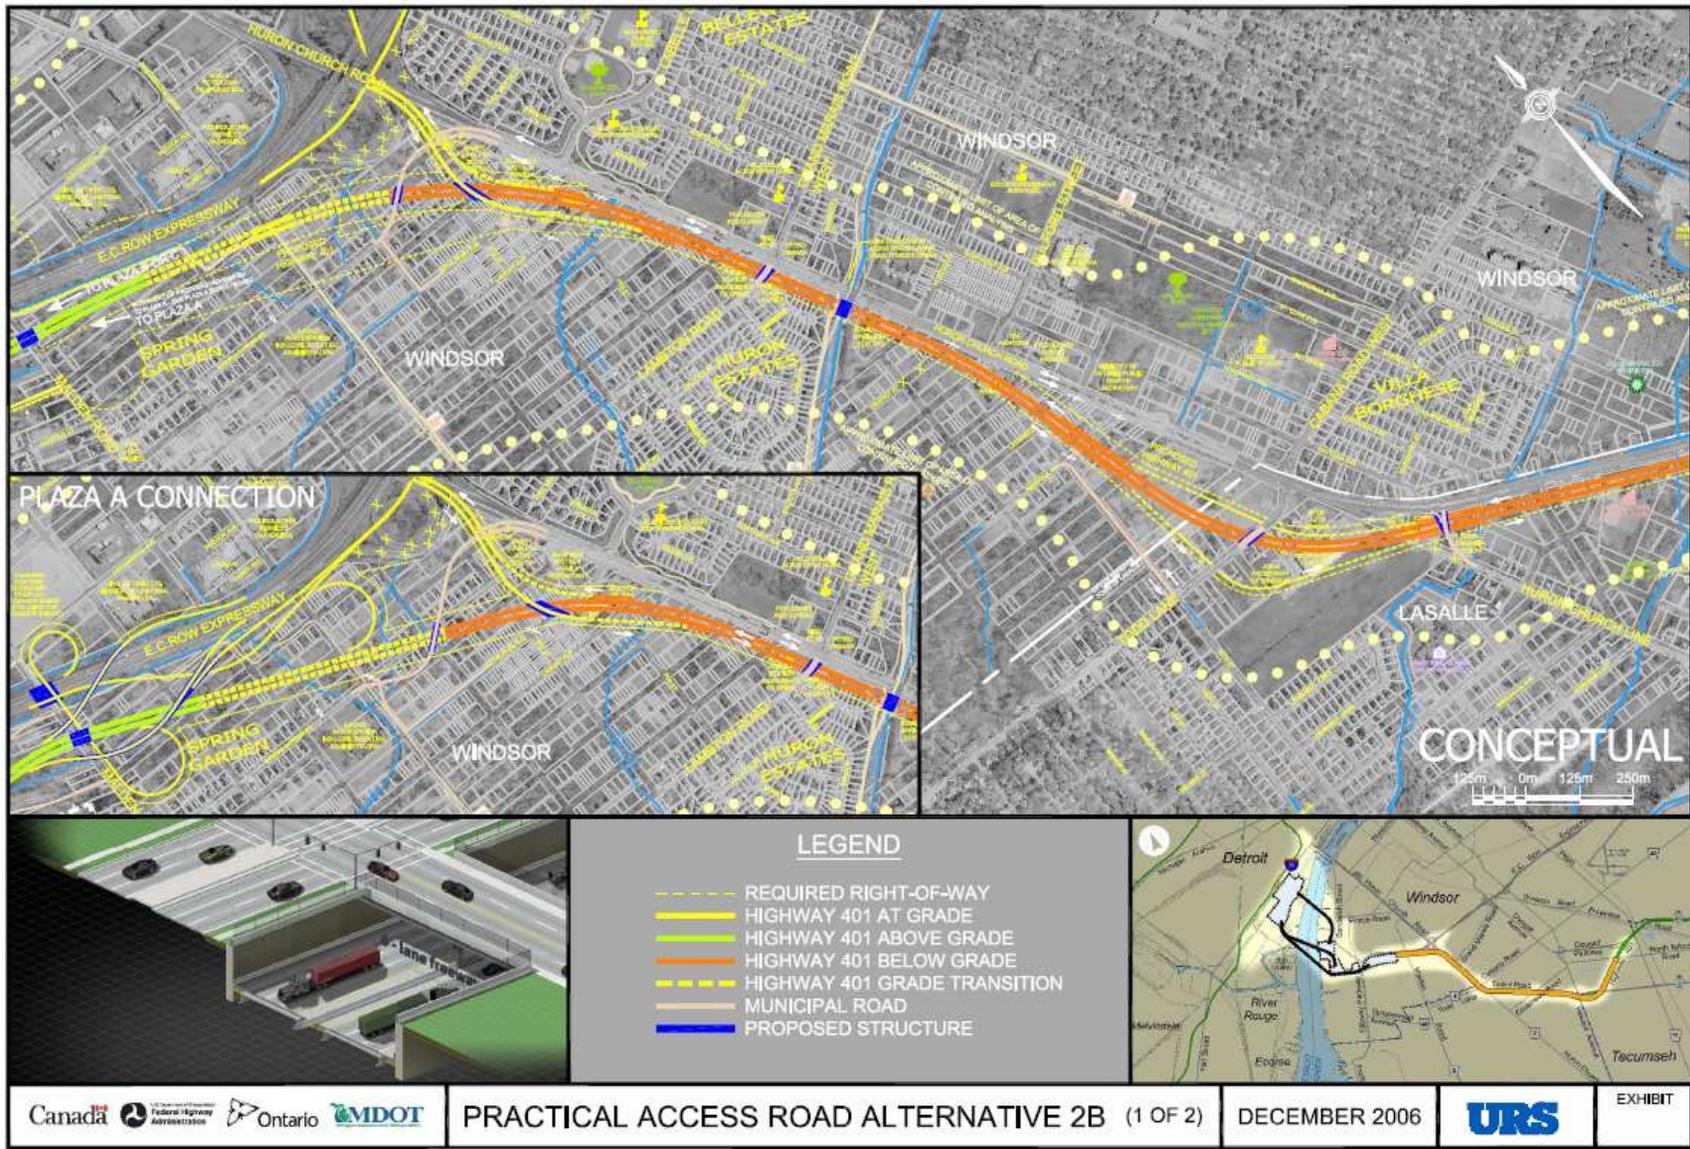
PRACTICAL ACCESS ROAD ALTERNATIVE 2B
